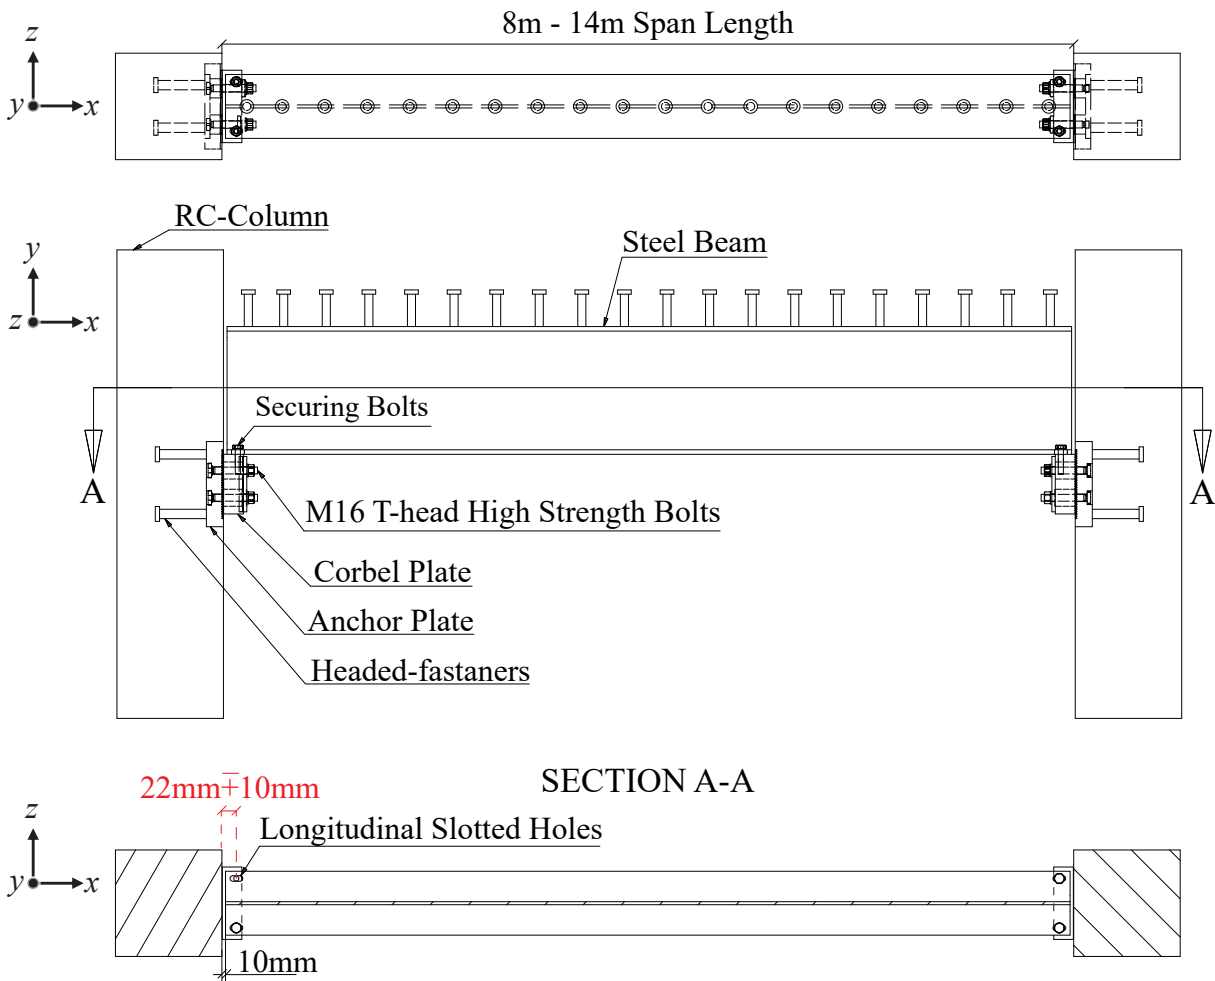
SMIBC joint in reinforced-concrete (RC) column configuration.
